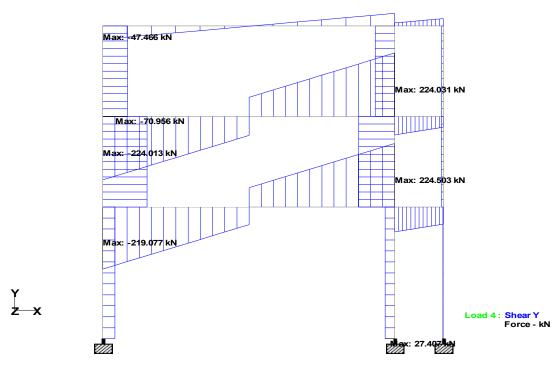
Shear forces of a typical reinforced concrete frame within the model (RC Frame 1)
